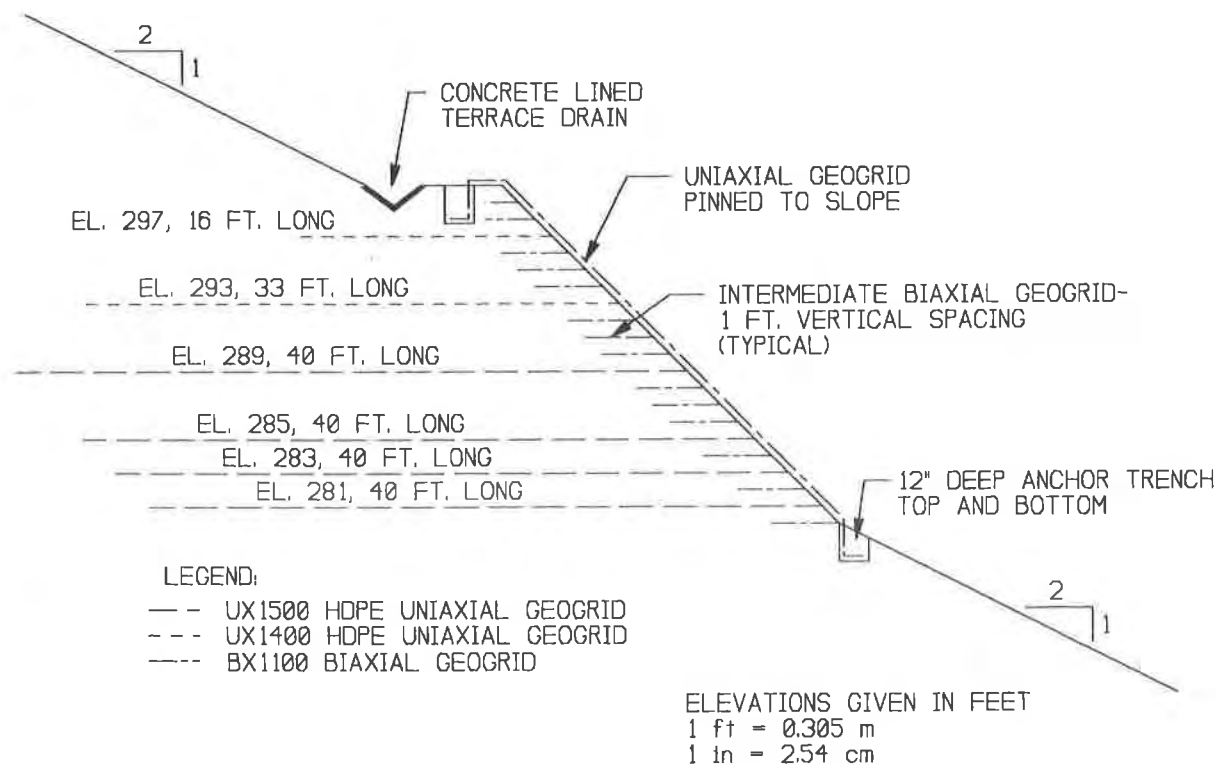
CONSTRUCTION DETAIL OF CONTOUR GRADED SLOPE FOR SPANISH HILLS
